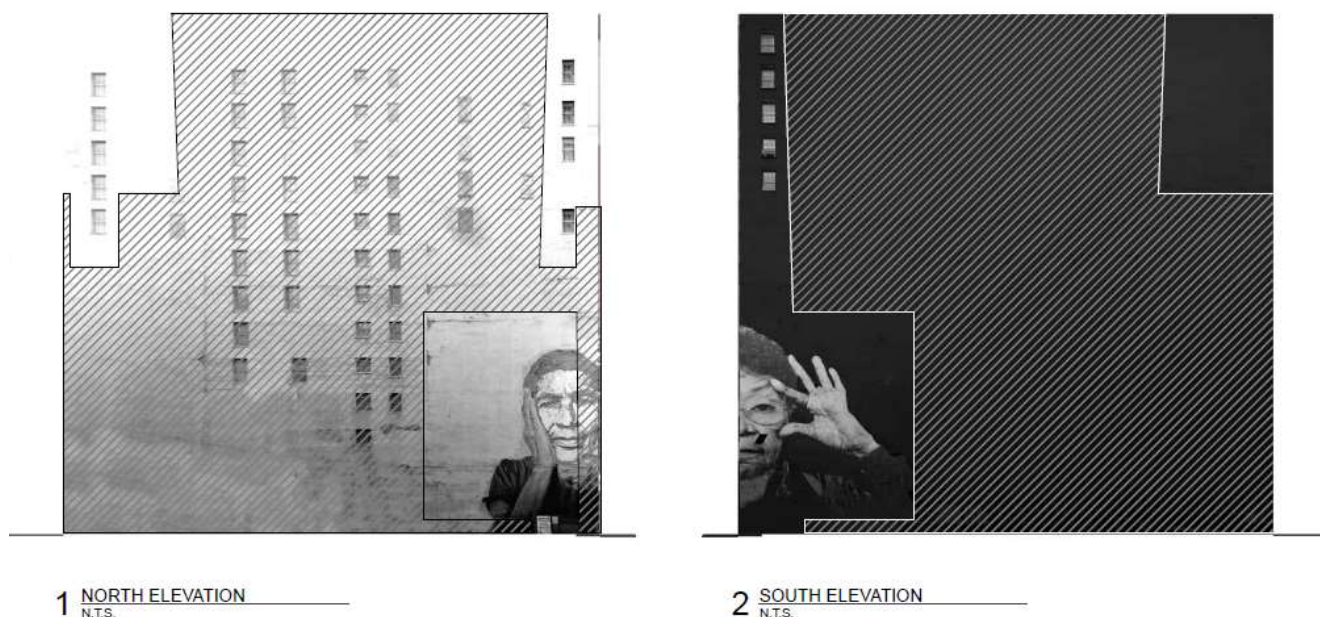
Adjacent Building Coverage (Adam Sokol Architecture Practice/HLW, Inc., April 2016)
